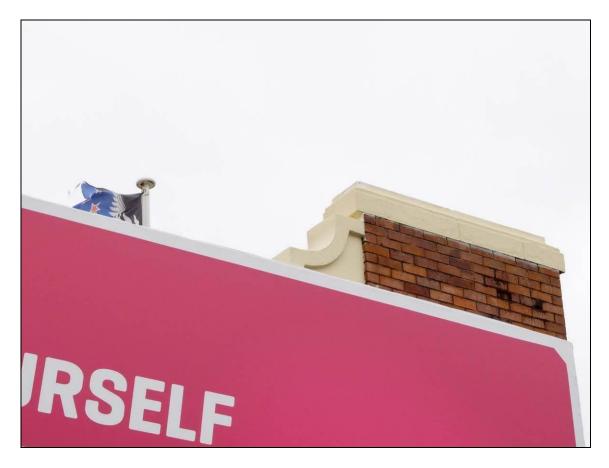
The site May 2016 – The northern elevation – looking at the returned brick, the parapet coping and the advertising billboard. Photograph: Blair Hastings.
